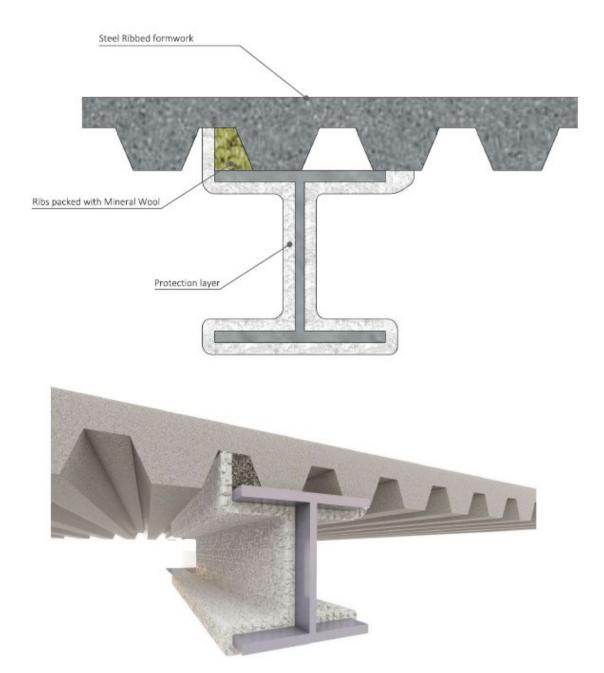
PERLIFOC HP Eco+ or PYROCRETE 60 spray protected steel beam interfacing with composite floor – Steel beam parallel to voids
